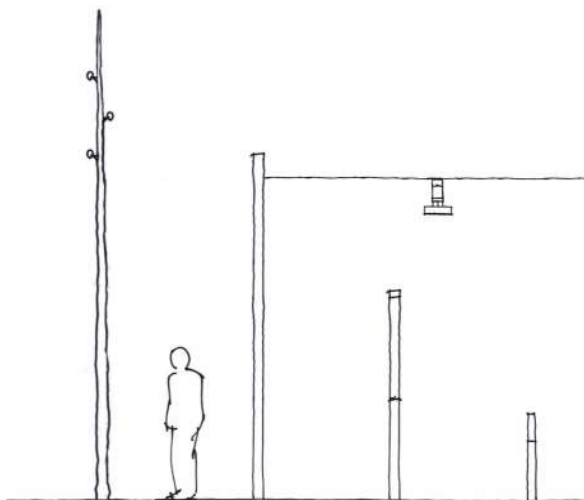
Site Lighting Standards within private site development and parks & openspace.
